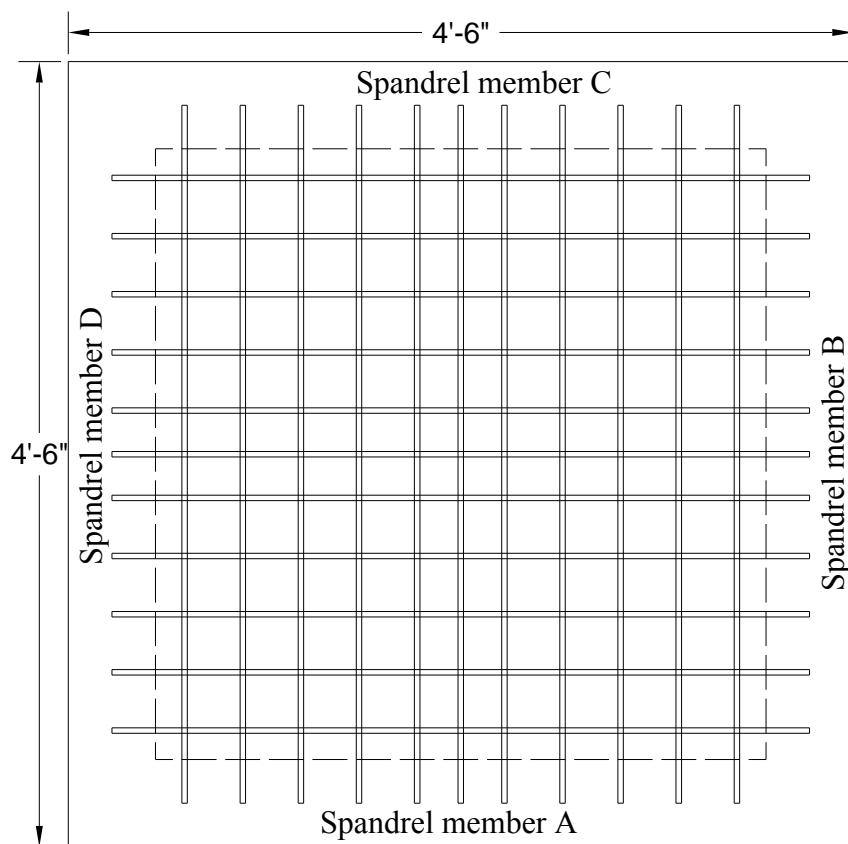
Plan of SL02 and SL03 showing slab reinforcement
